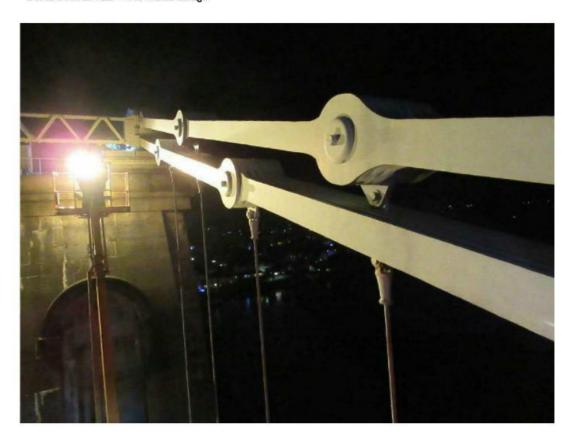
Primary deck element - upper south face of south tower and south east back-stay chains.
